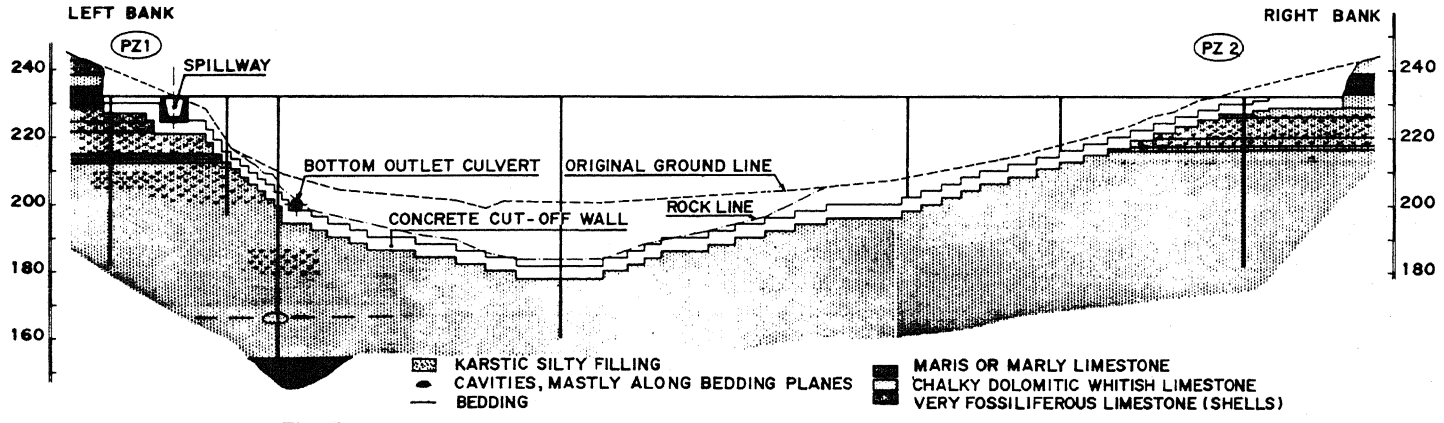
Longitudinal Cross-Section of Main Dam Embankment
